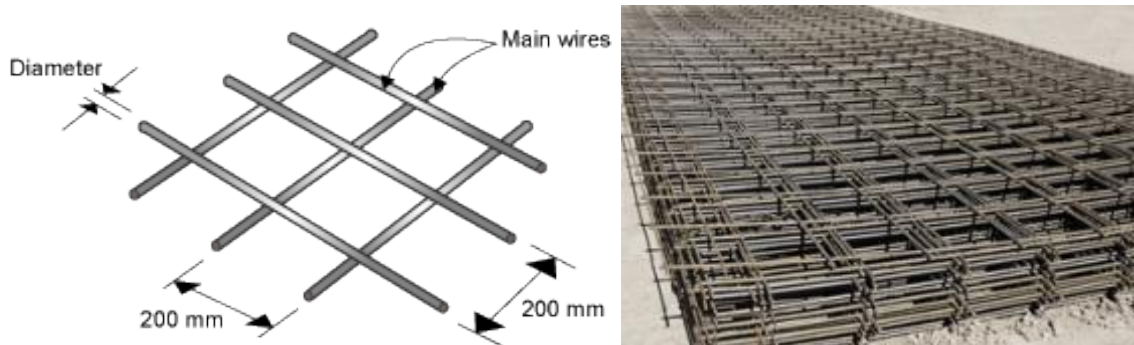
Typical reinforcing mesh use for concrete slab of the base of the water tank (Onesteel 2014)
